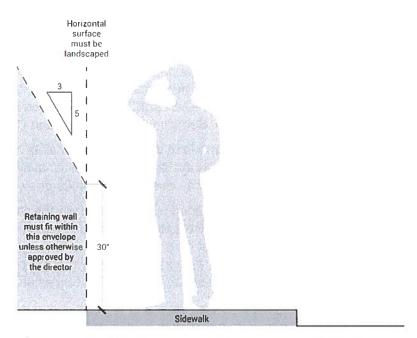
b. Allowed envelope for walls in street front setback.
